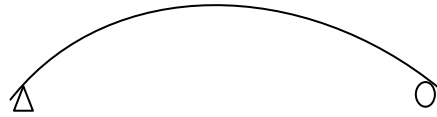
Camber in precast, prestressed concrete girder
